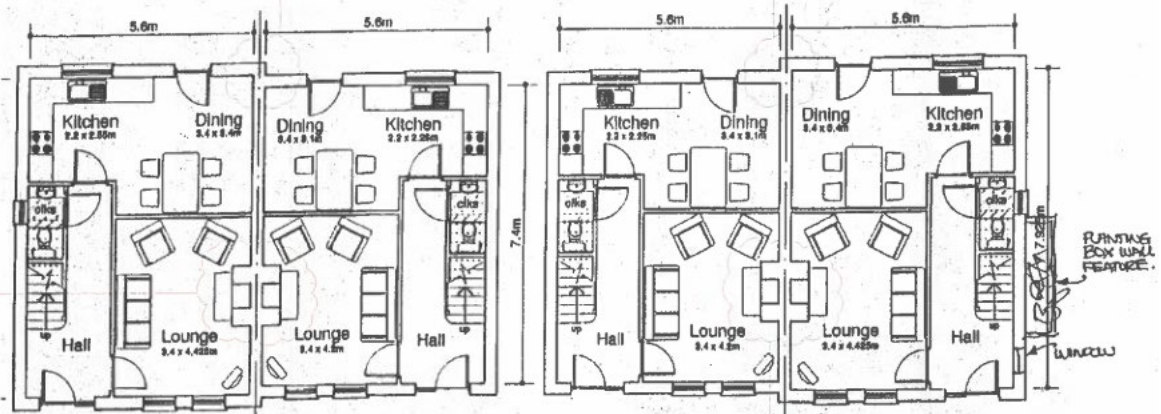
Previously Approved Ground Floor Plans under W/2003/1085/F
